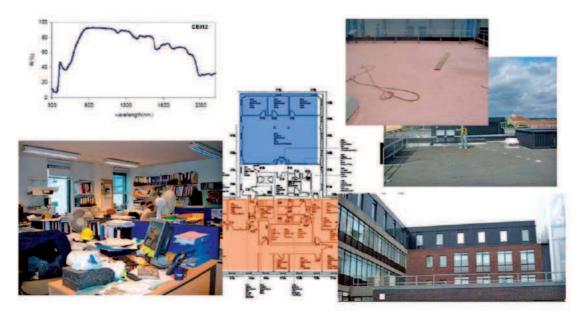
Floor plan and photos of the office and roof including the solar reflectance of the cool material applied
